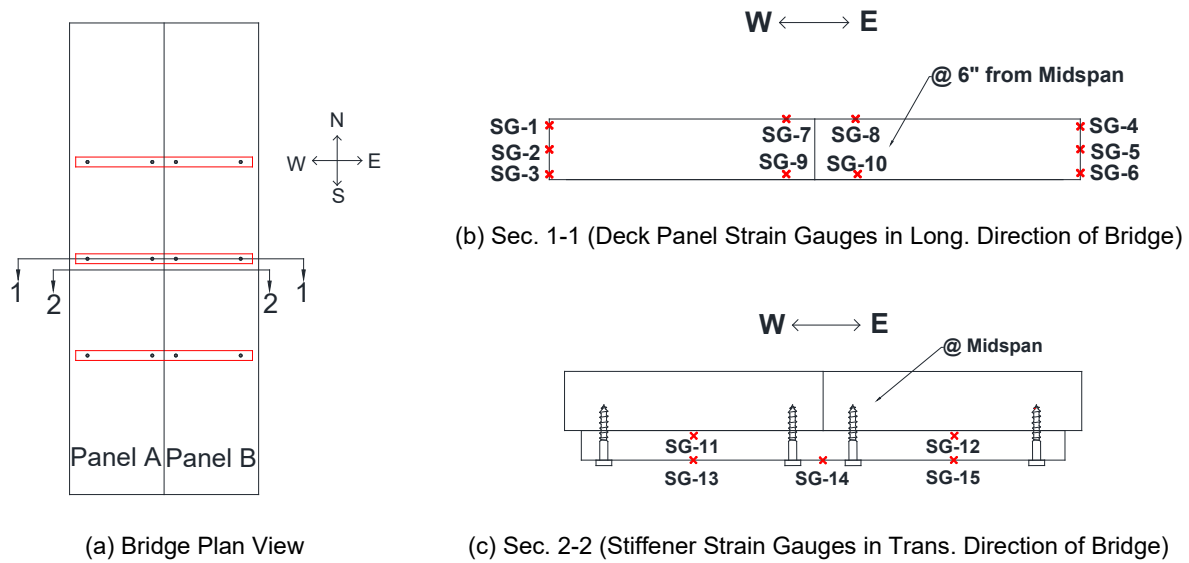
Strain Gauge Plan for the Glulam Timber Slab Bridge Specimen
